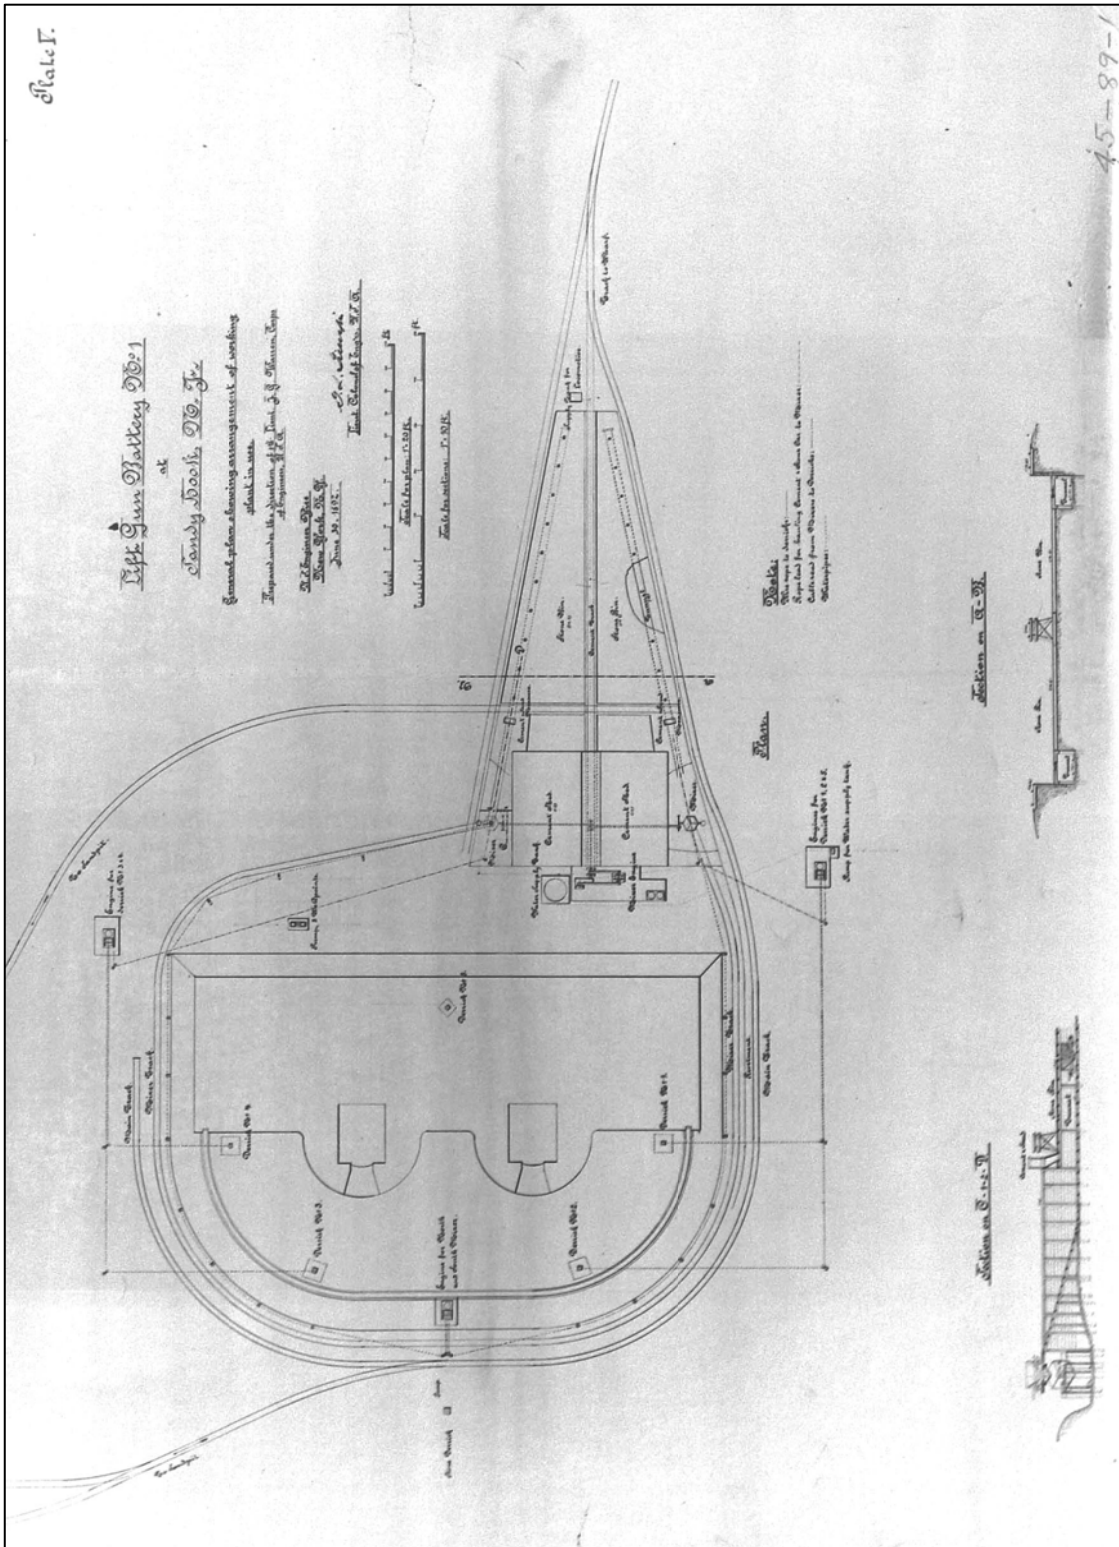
"Gun Lift Battery No. 1, at Sandy Hook, N. J." Plan of Battery Potter showing general layout of battery and concrete plant. Prepared under the direction of 1st Lt. J.G. Warren, June 30, 1892.
